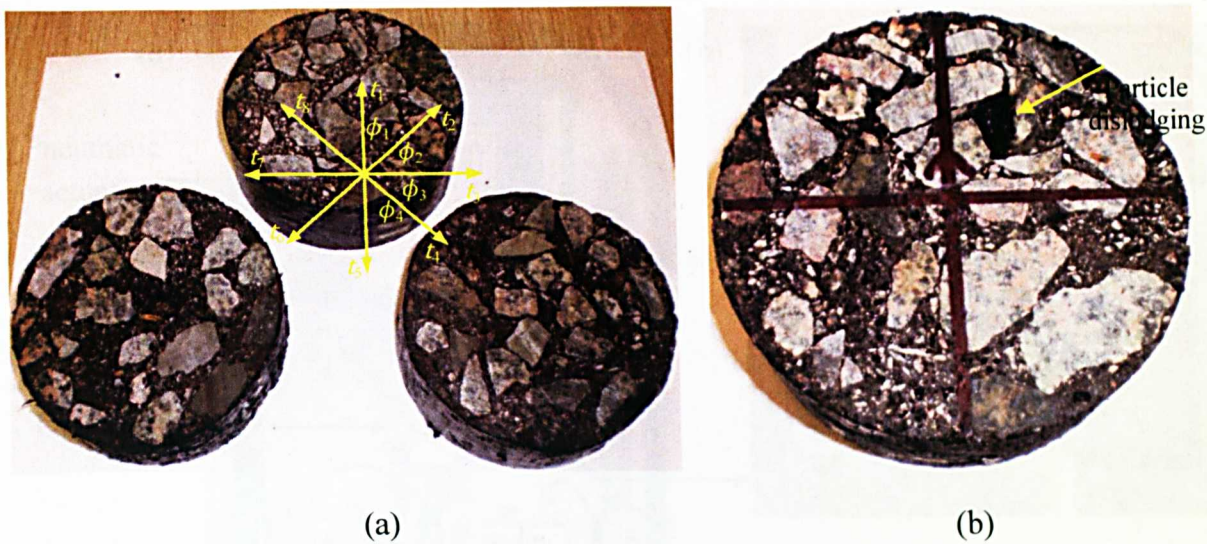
Specimens for fatigue testing after cutting and trimming
